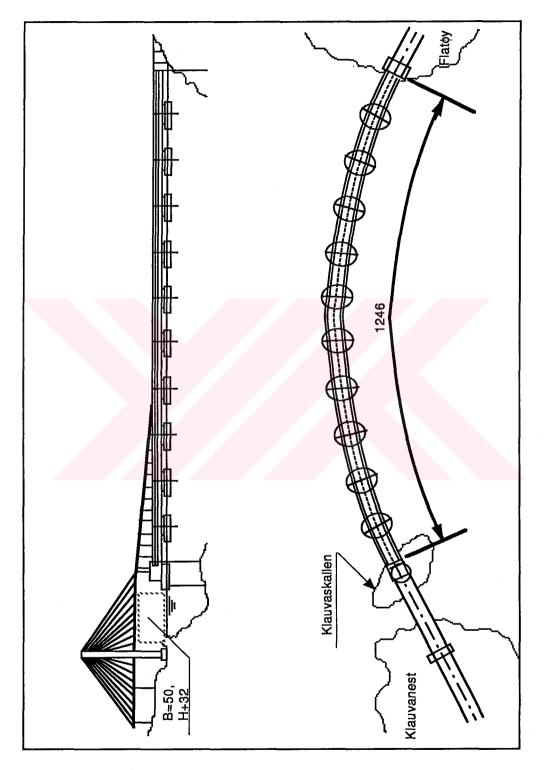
PLAN AND ELEVATION (in meters)
